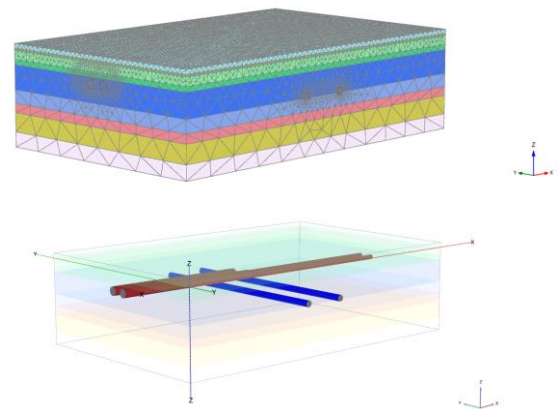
Images detailing model layout and geometry (NL tunnels shown in red and JLE tunnels shown in blue)
